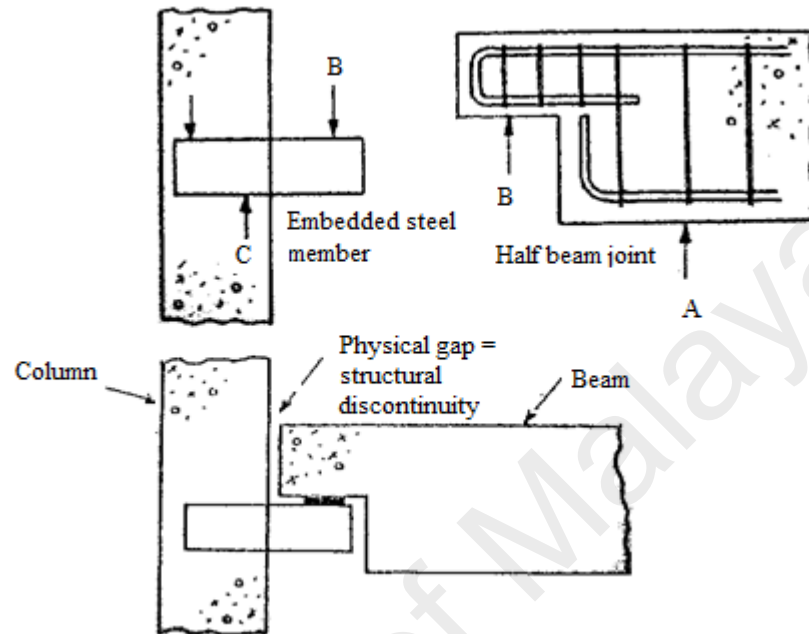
Beam to column connection using halving joints and cast in steel insert (Elliott, 1996)
